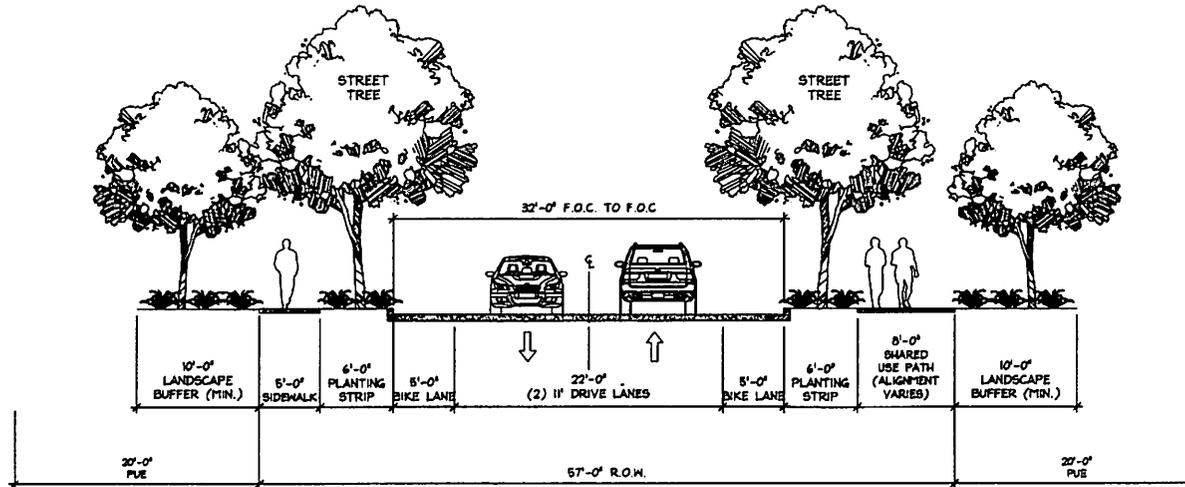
EXHIBIT F - PD STREET STANDARDS - STREET SECTIONS
